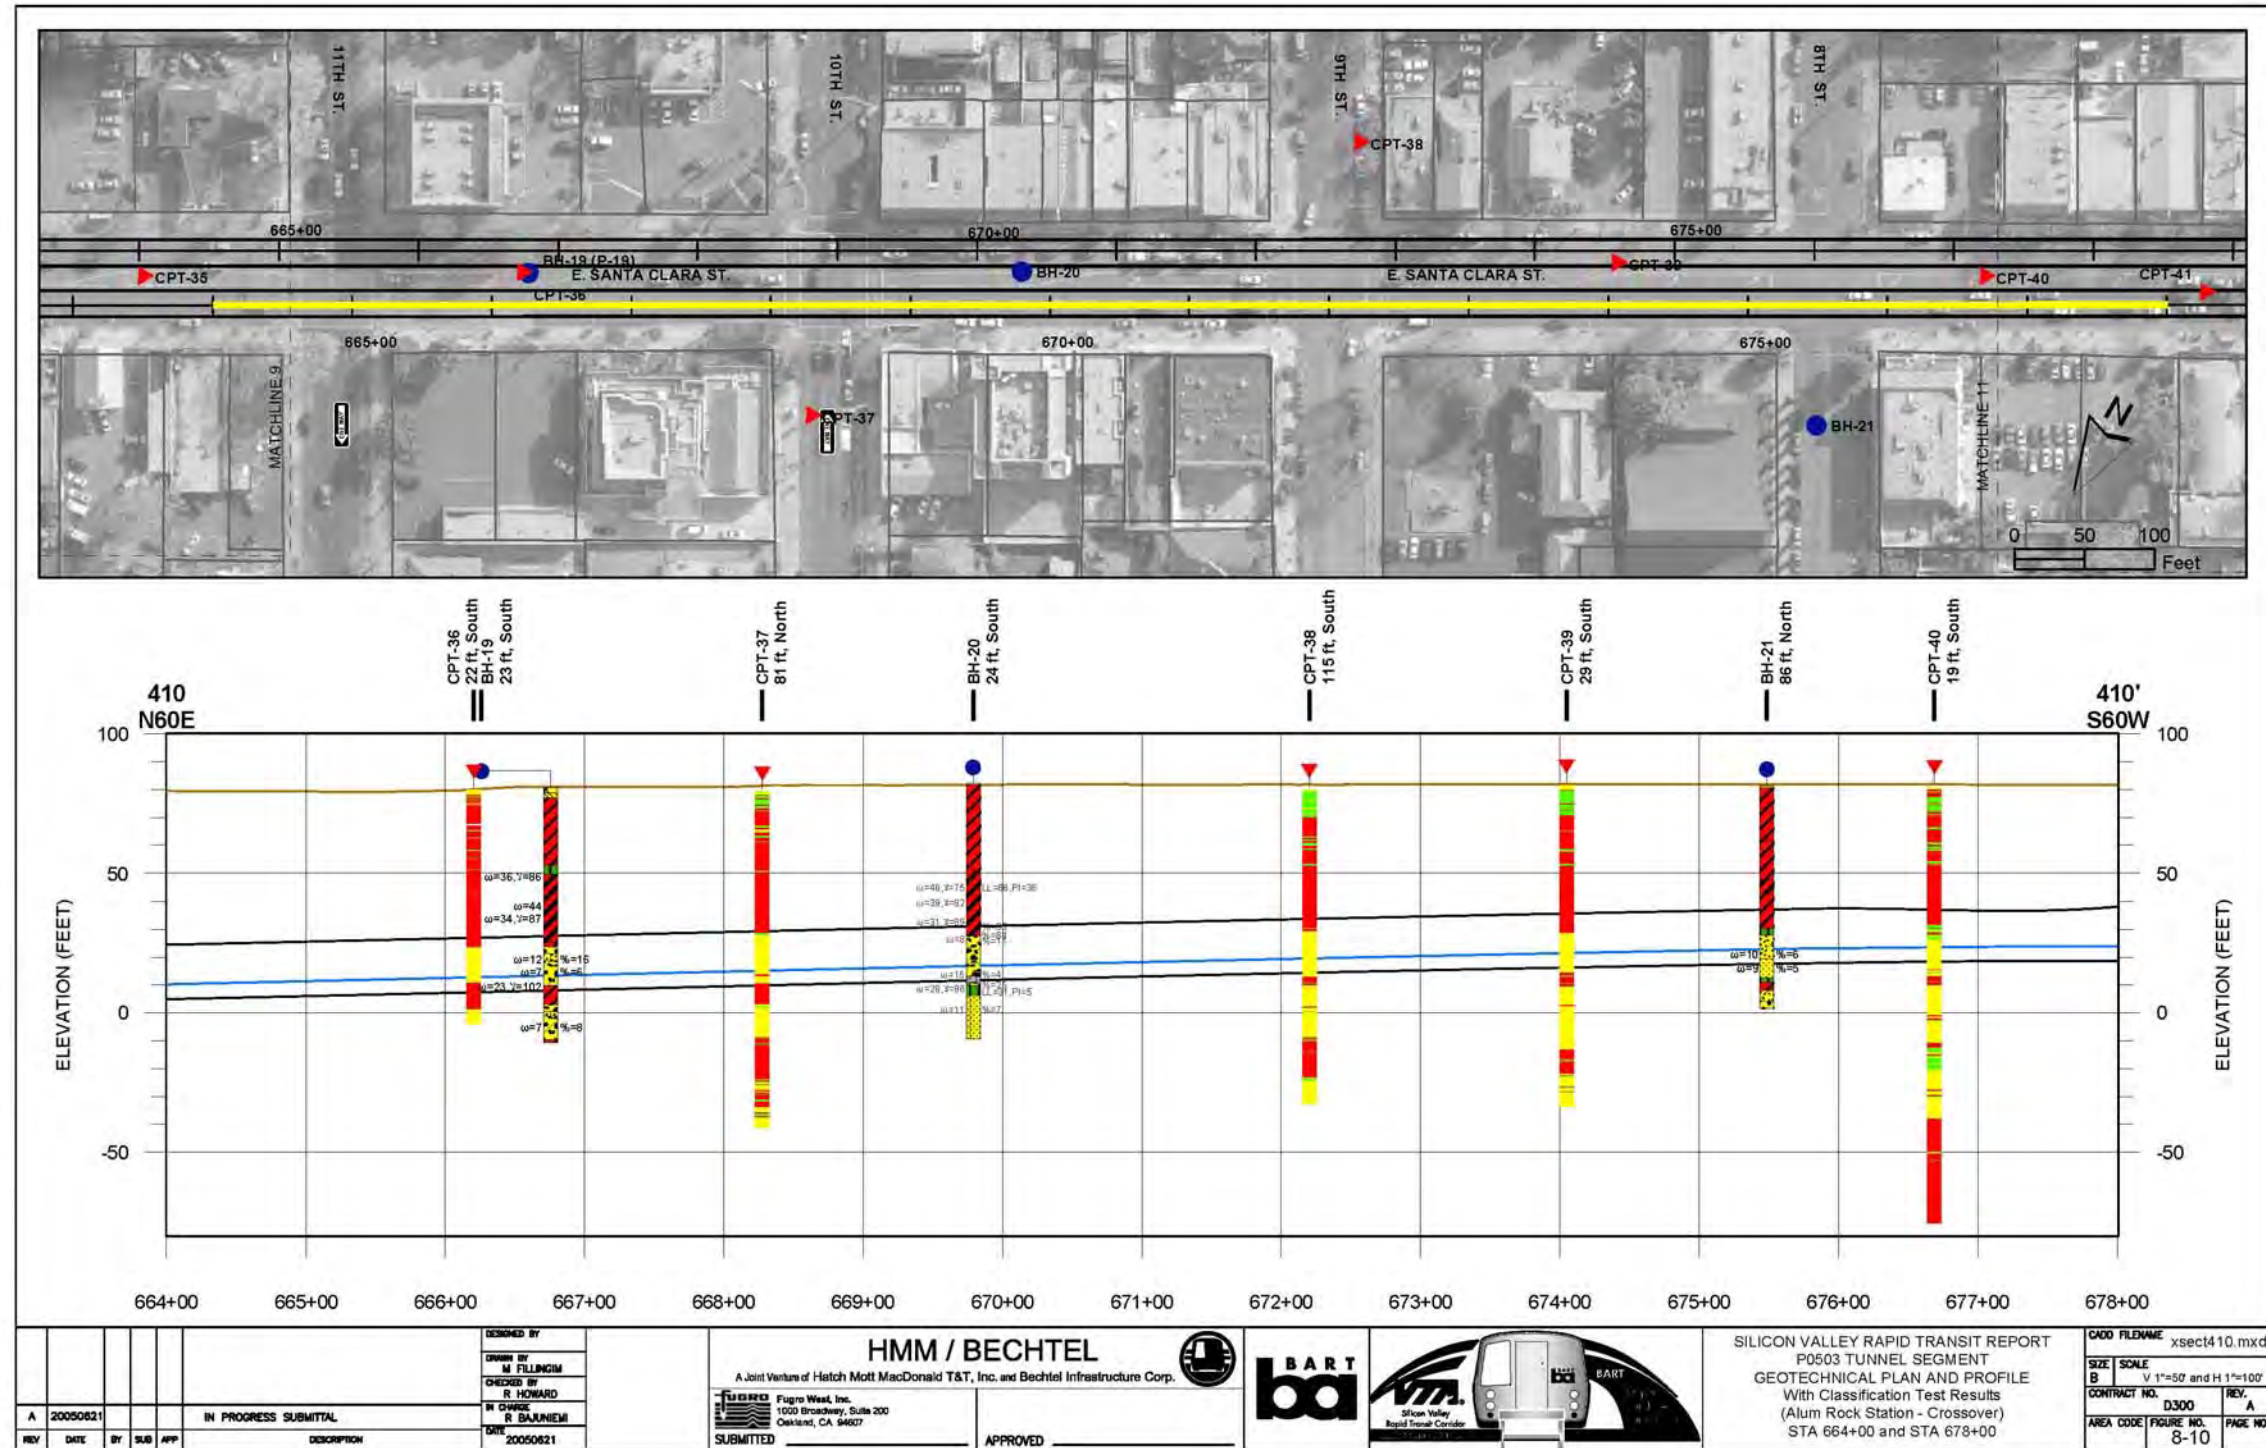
Geotechnical Plan and Profile with Classification Test Results: Station 664+00 to 678+00.
